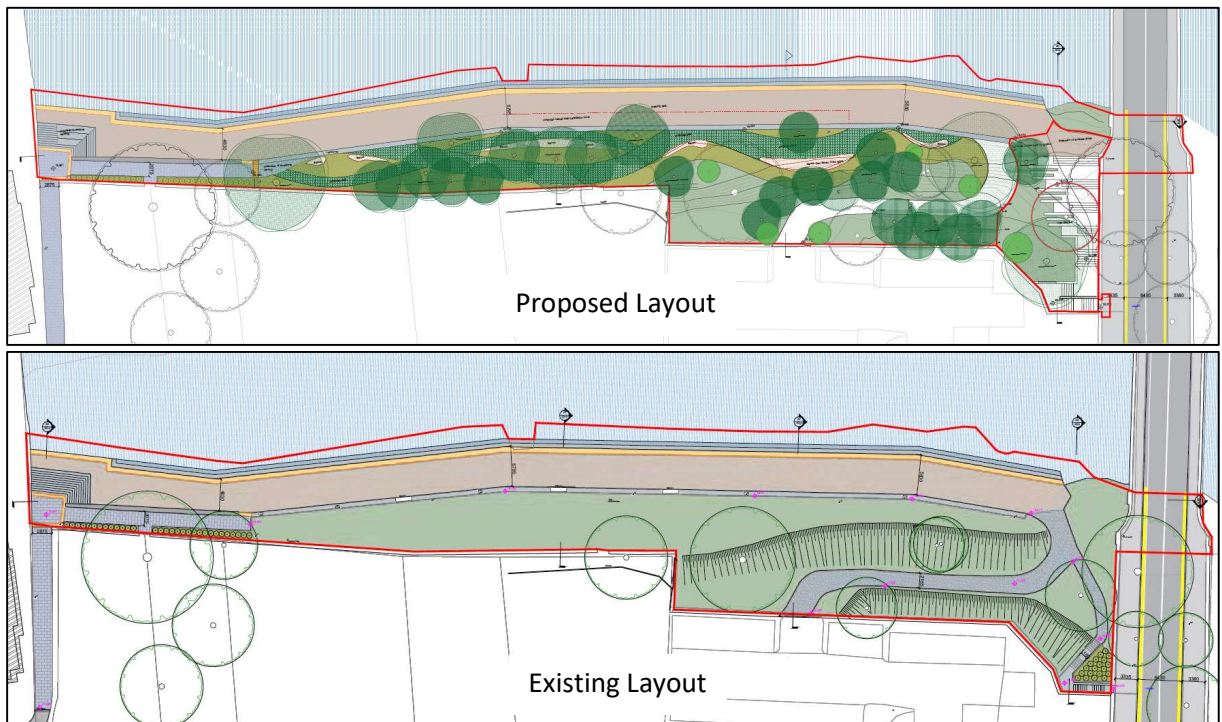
Riverside Promenade - Existing and Proposed Layout
